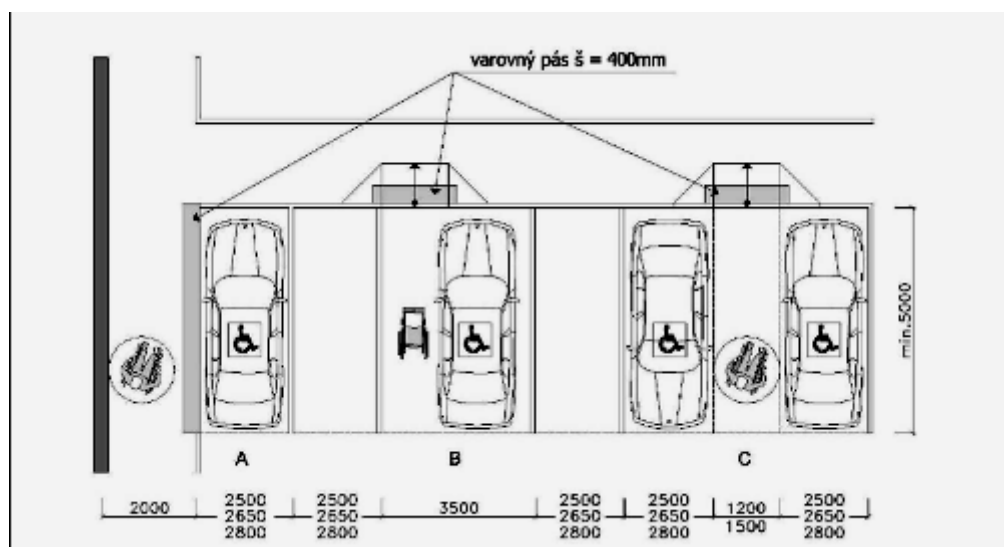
Reserved perpendicular parking space: A - at the pavement, B - parking with its own handling area, C - two spaces with a shared handling area (Zdařilová, 2011)
